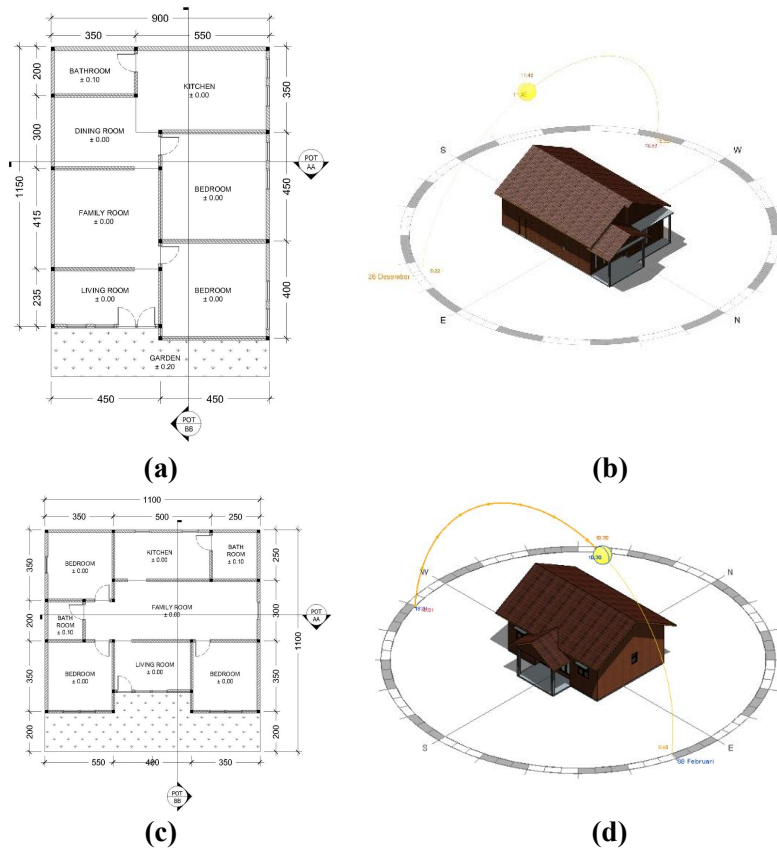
(a) Abdul Ghafur house Floor Plan; (b) Abdul Ghafur house Sun Direction; (c) Supardi house Floor Plan; (d) Supardi house Sun Direction.
